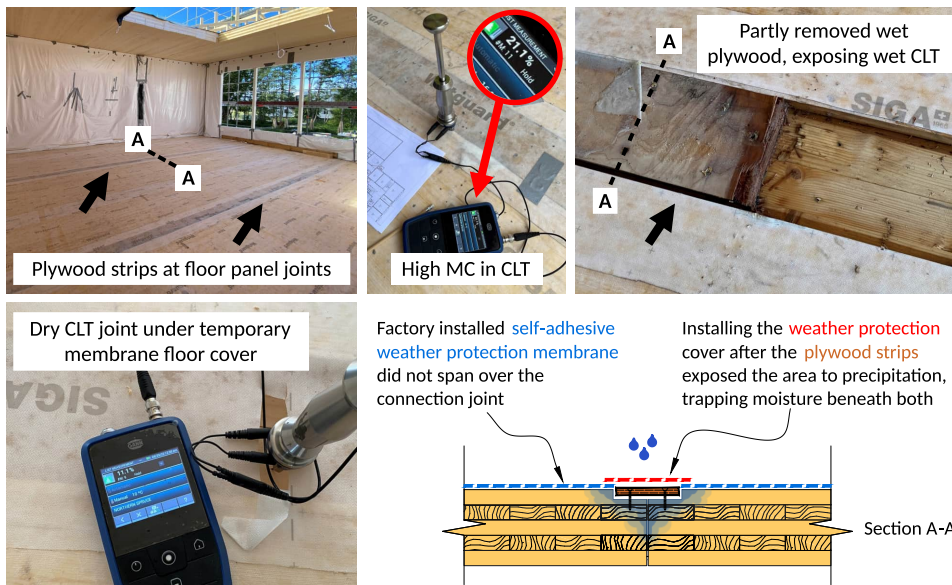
Problematic floor panel connection joint in building G. Water ingress to CLT floor joints raised CLT MC above 20 %. Initially, a plywood strip was installed before the weather protection membrane, but in a revised method, the membrane was installed first, ensuring dry construction.
